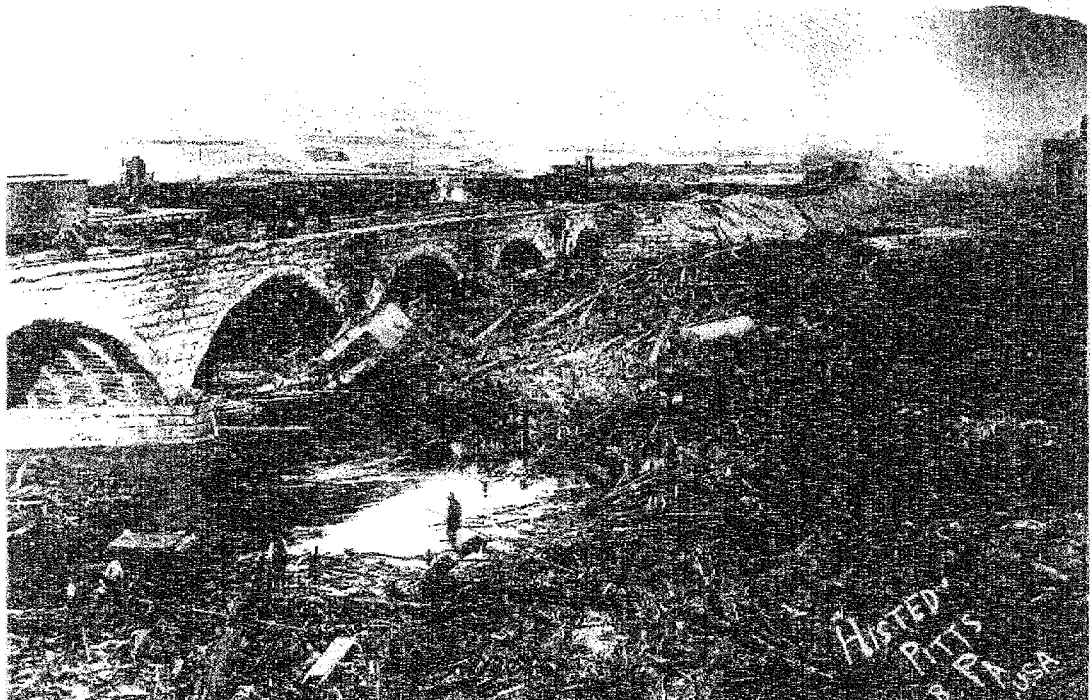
Refuse from the 1889 flood, at the site of the Pennsylvania Railroad's Stone Bridge on the Conemaugh River.
